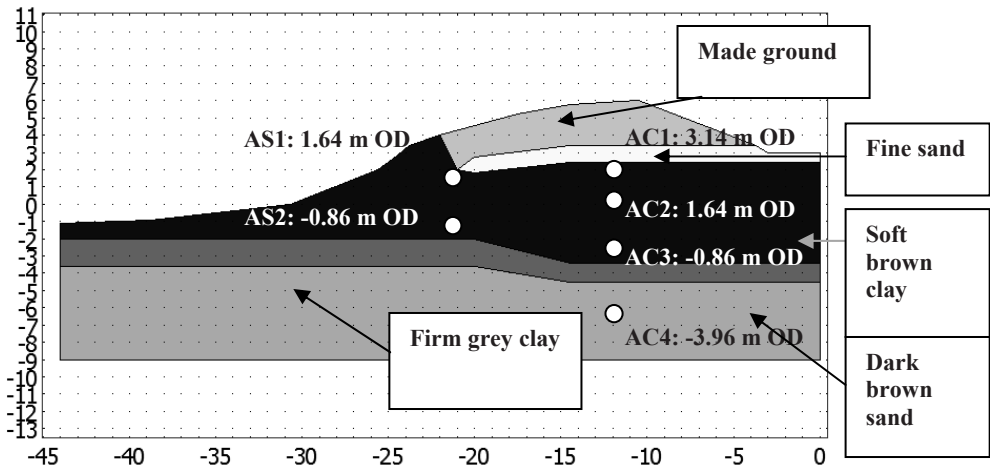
Scheme of the cross-section A: soil build-up and sensors elevations, metres from Ordnance Datum
